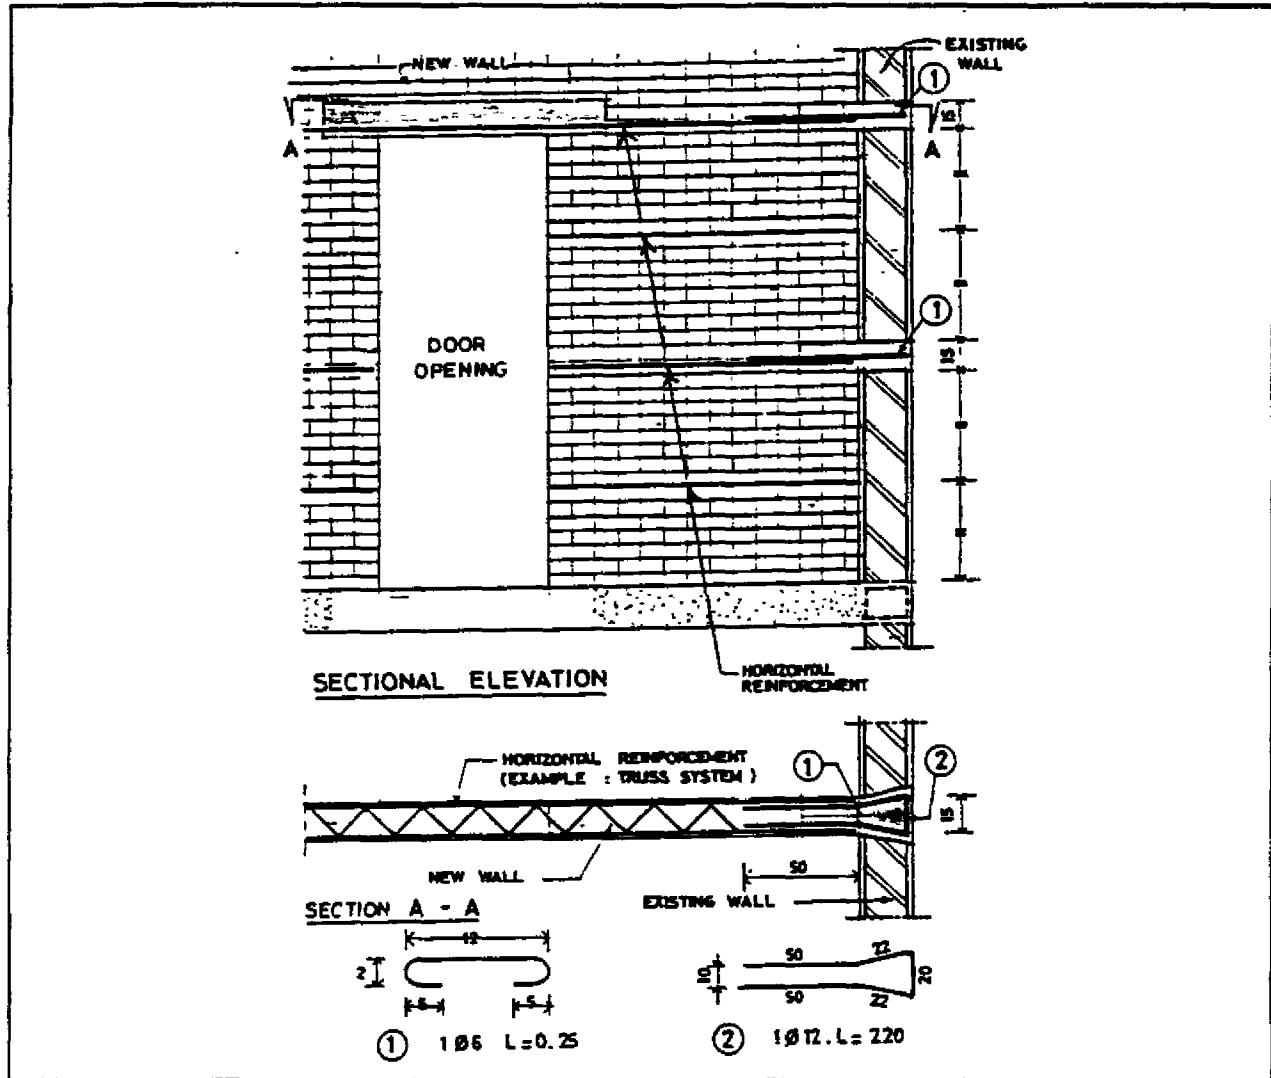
Connection of New and Old Walls (Tjunction). [1]
